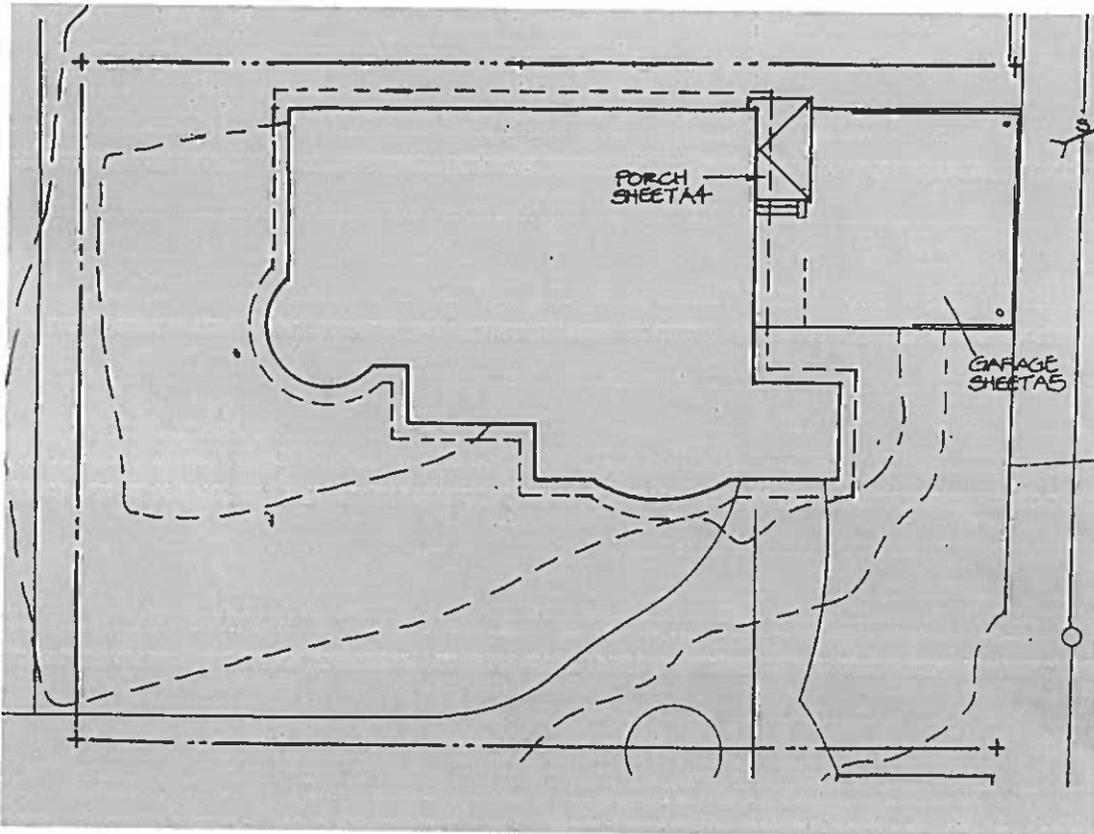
Site diagram. Note the sunken garage. The alley on the north side is ~15' below the house level.
